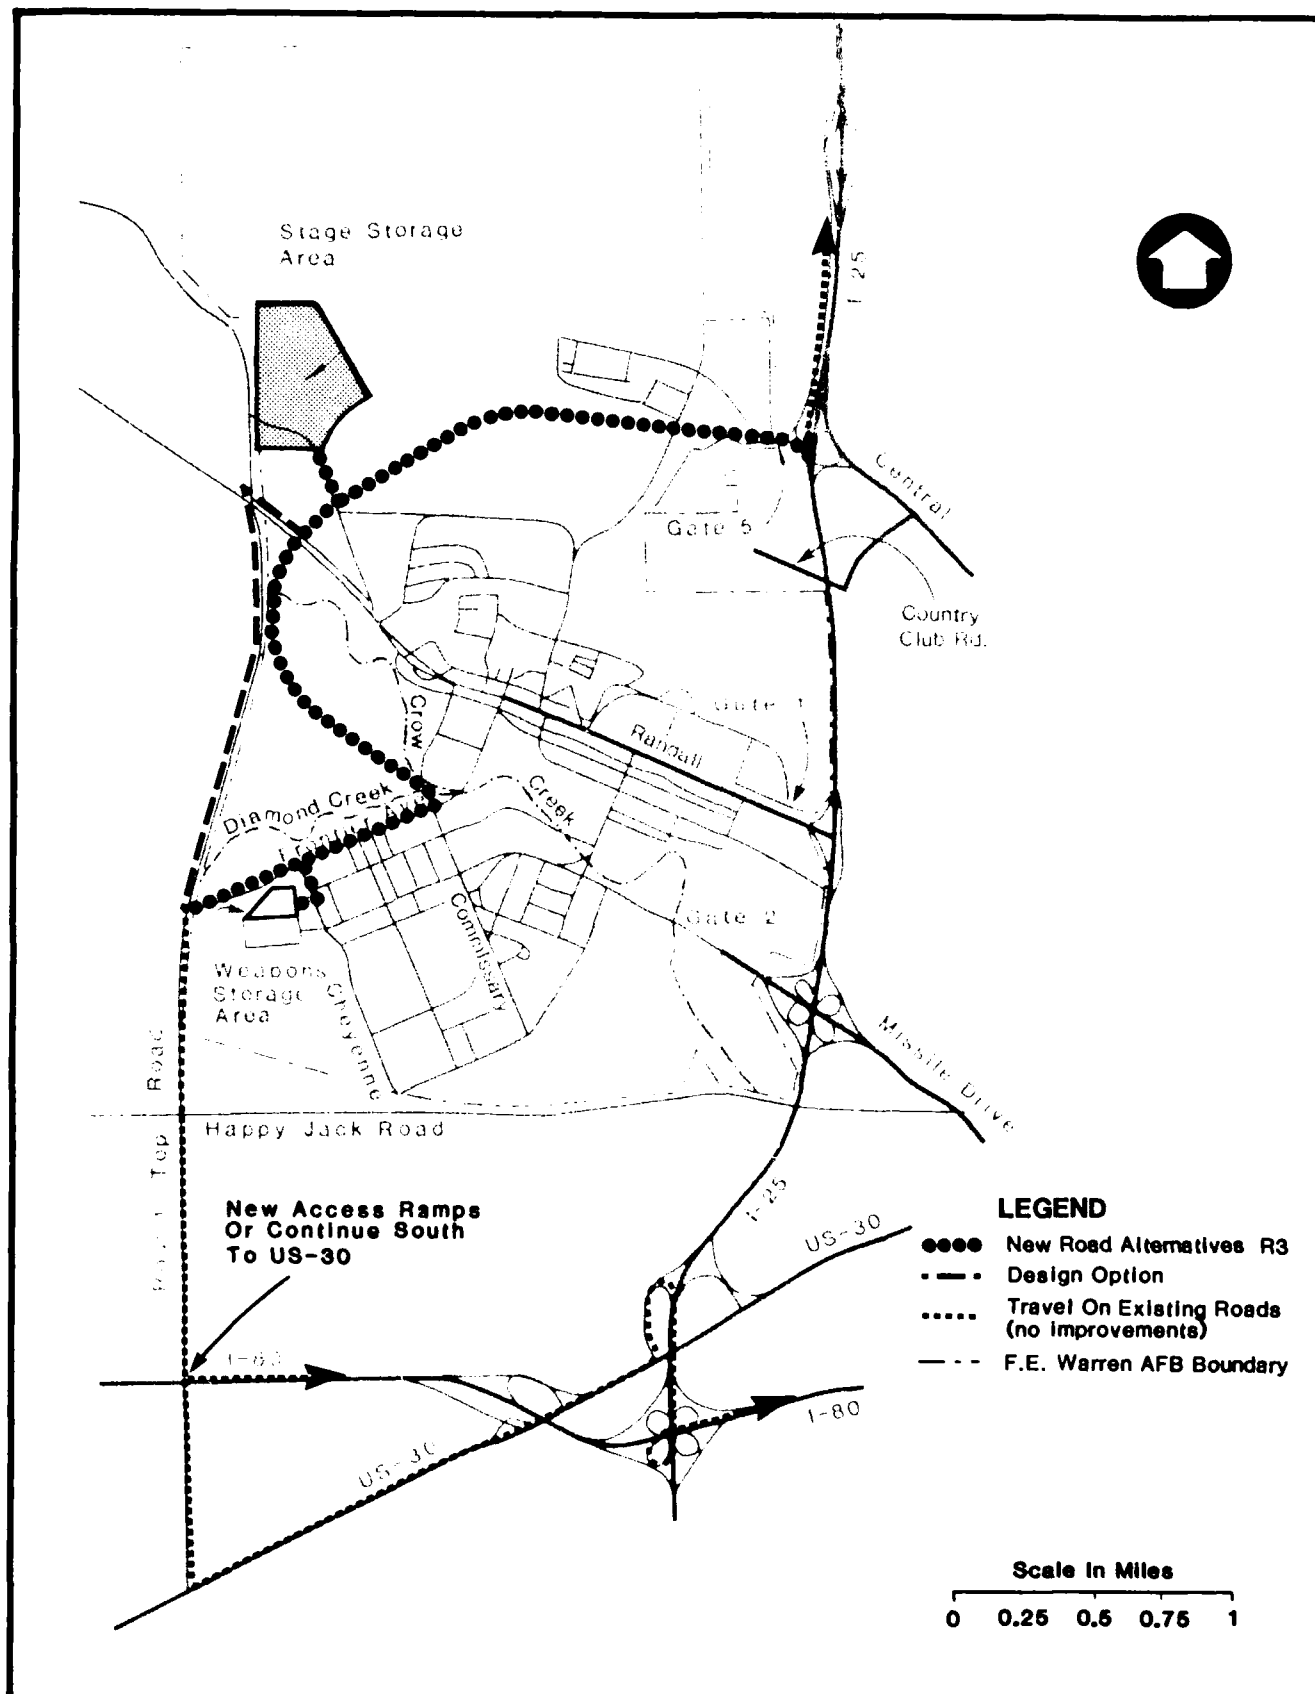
NEW ROADS AT F.E. WARREN AFB: ALTERNATIVE R3
